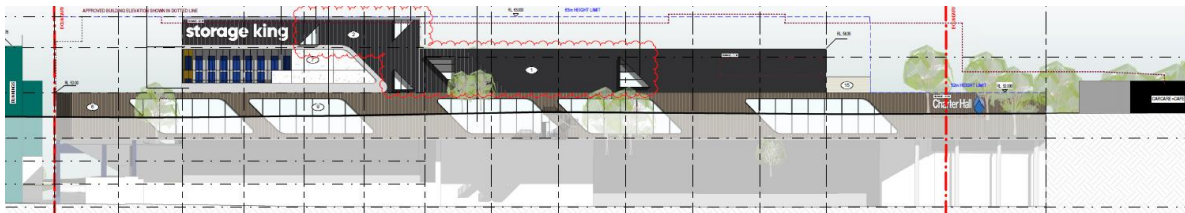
South Elevation (Victoria Road) – The blurred section is below the street level.
